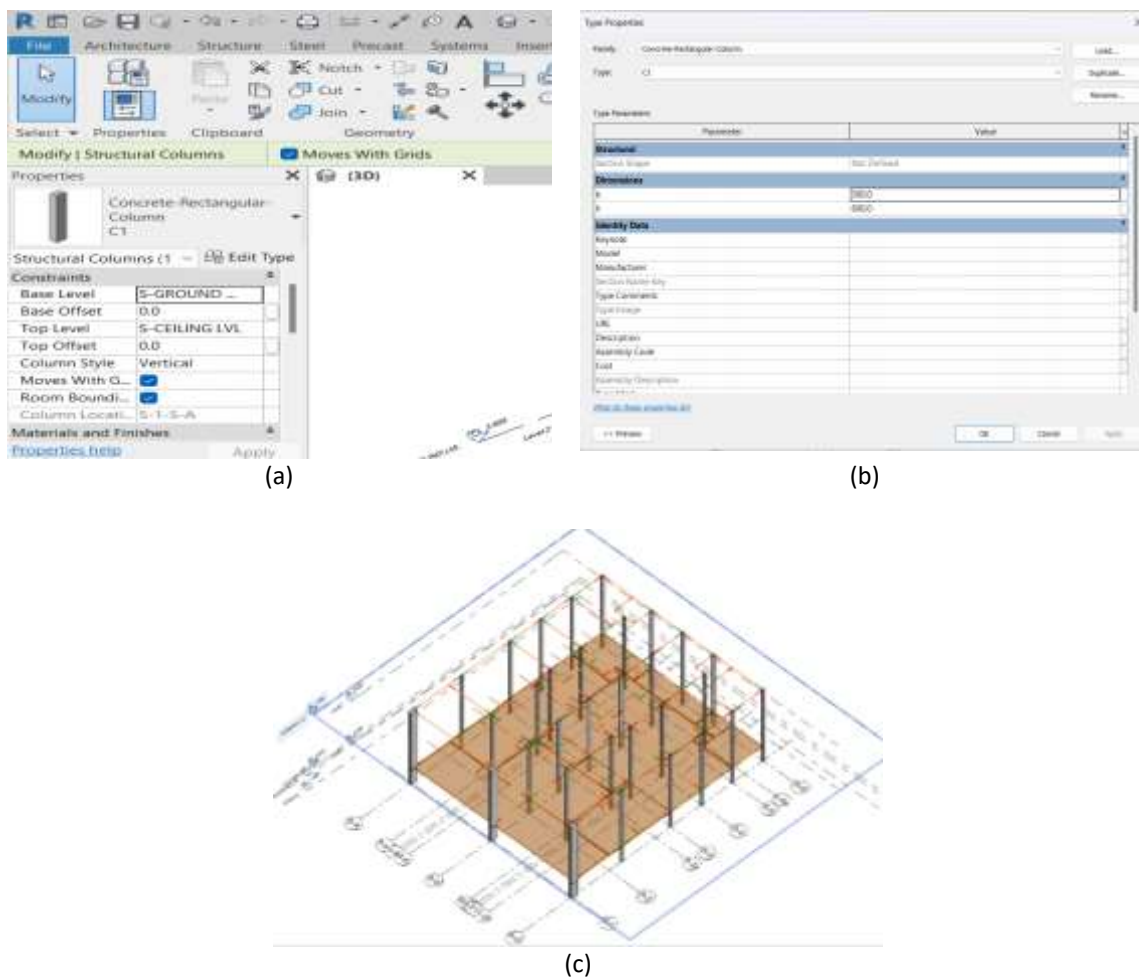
Construct column following the drawing (a) types of columns (b) dimensions of columns (c) 3D views of all columns
